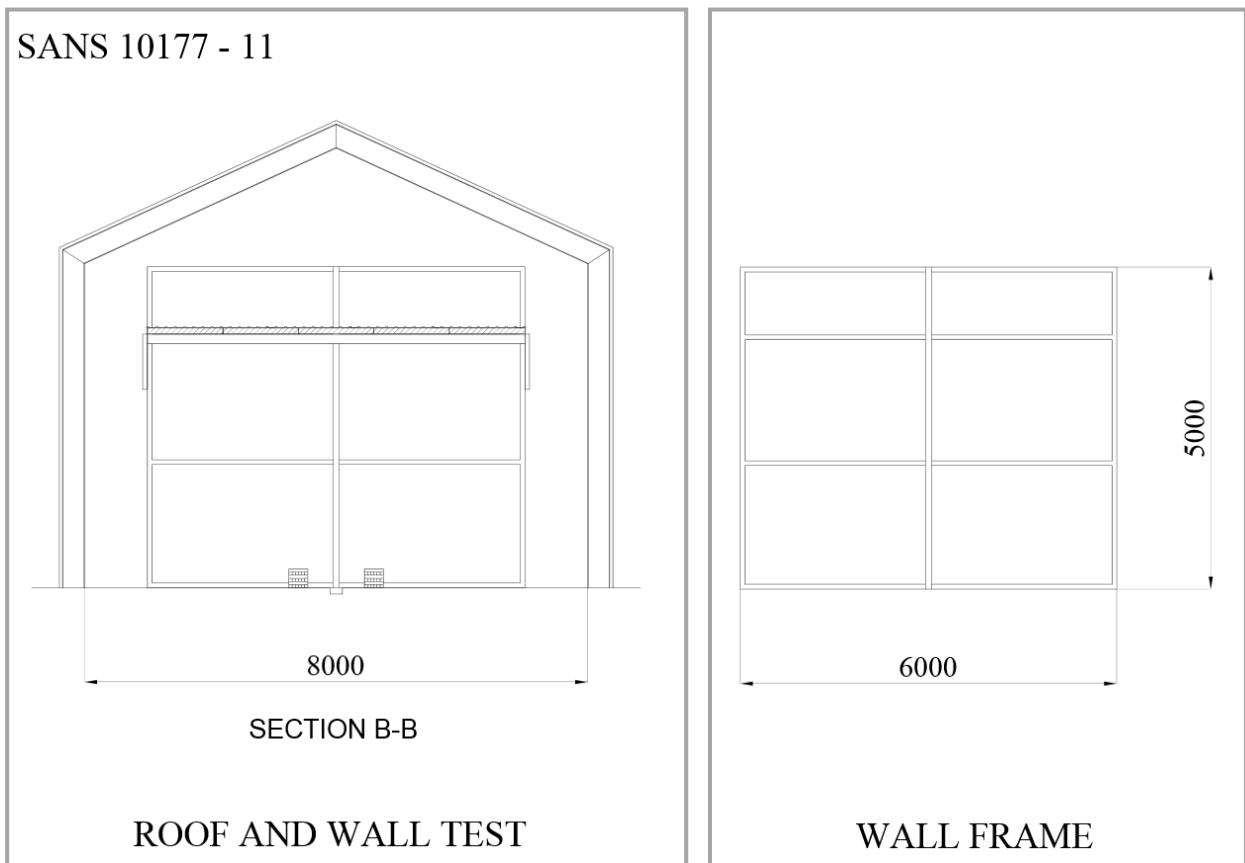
Typical side-cladding installation in SANS 10177-11 facility
